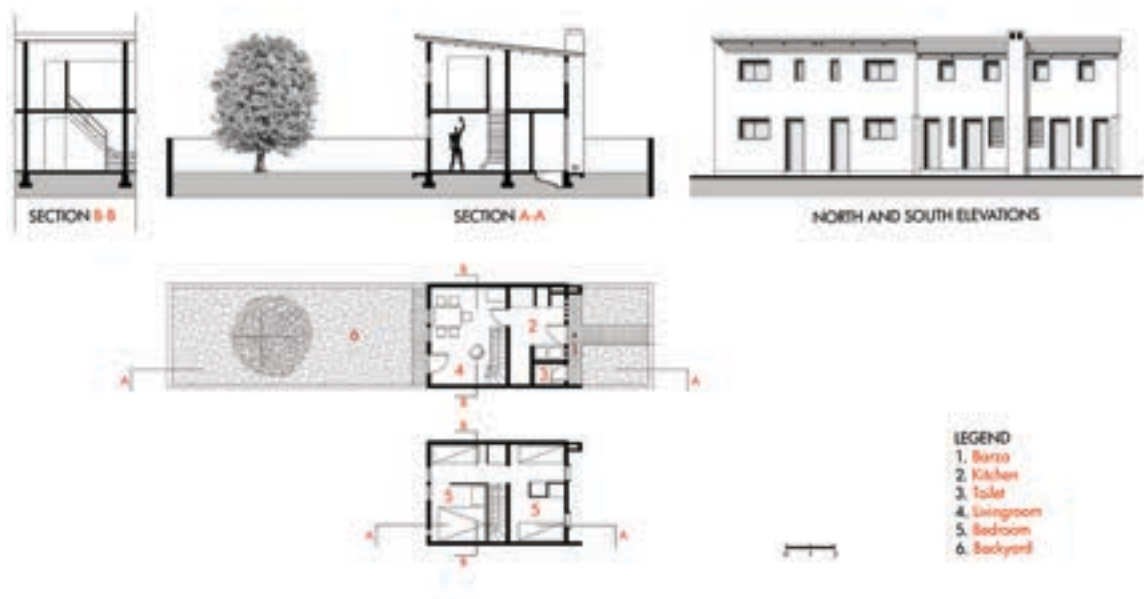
Plan views and section of the type “T” row house in Bandalungwa. Drawing by Manlio Michieletto.
